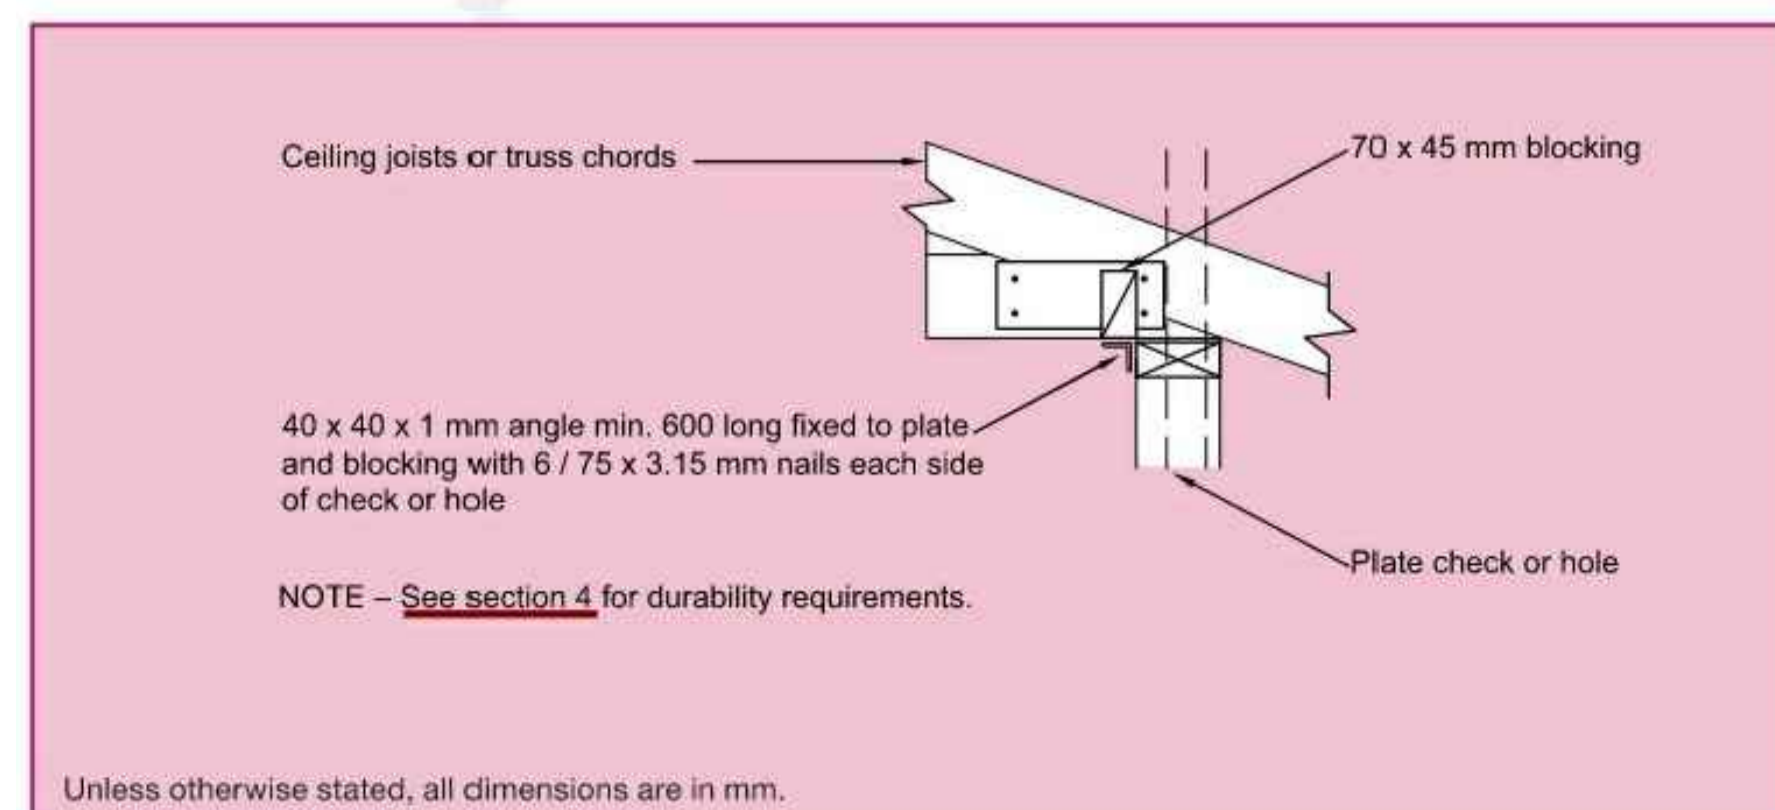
Cut top plate (see 8.7.5.1(c))
